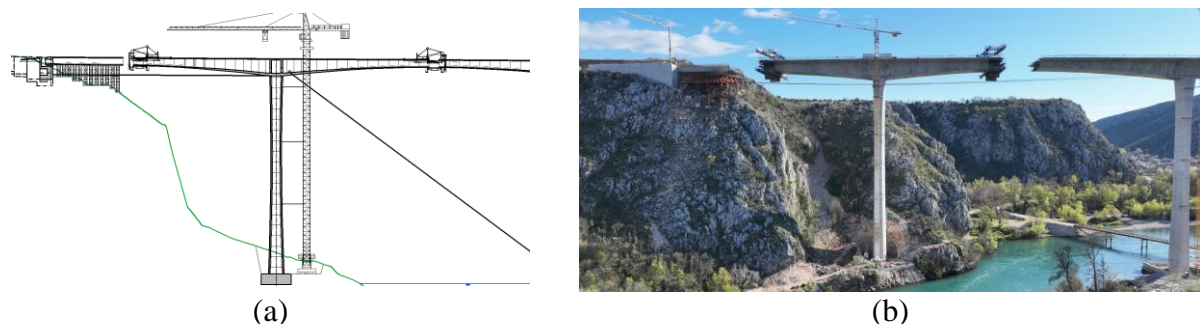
(a) Scheme of a balanced cantilever construction process on a prestressed concrete bridge; (b) Balanced cantilever construction method on a prestressed concrete bridge during construction
